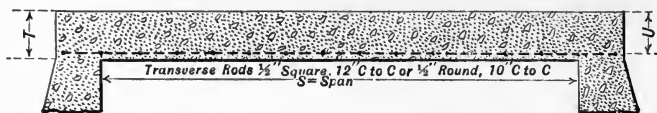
Reinforced Concrete Slab Culvert, Floor Dimensions.
